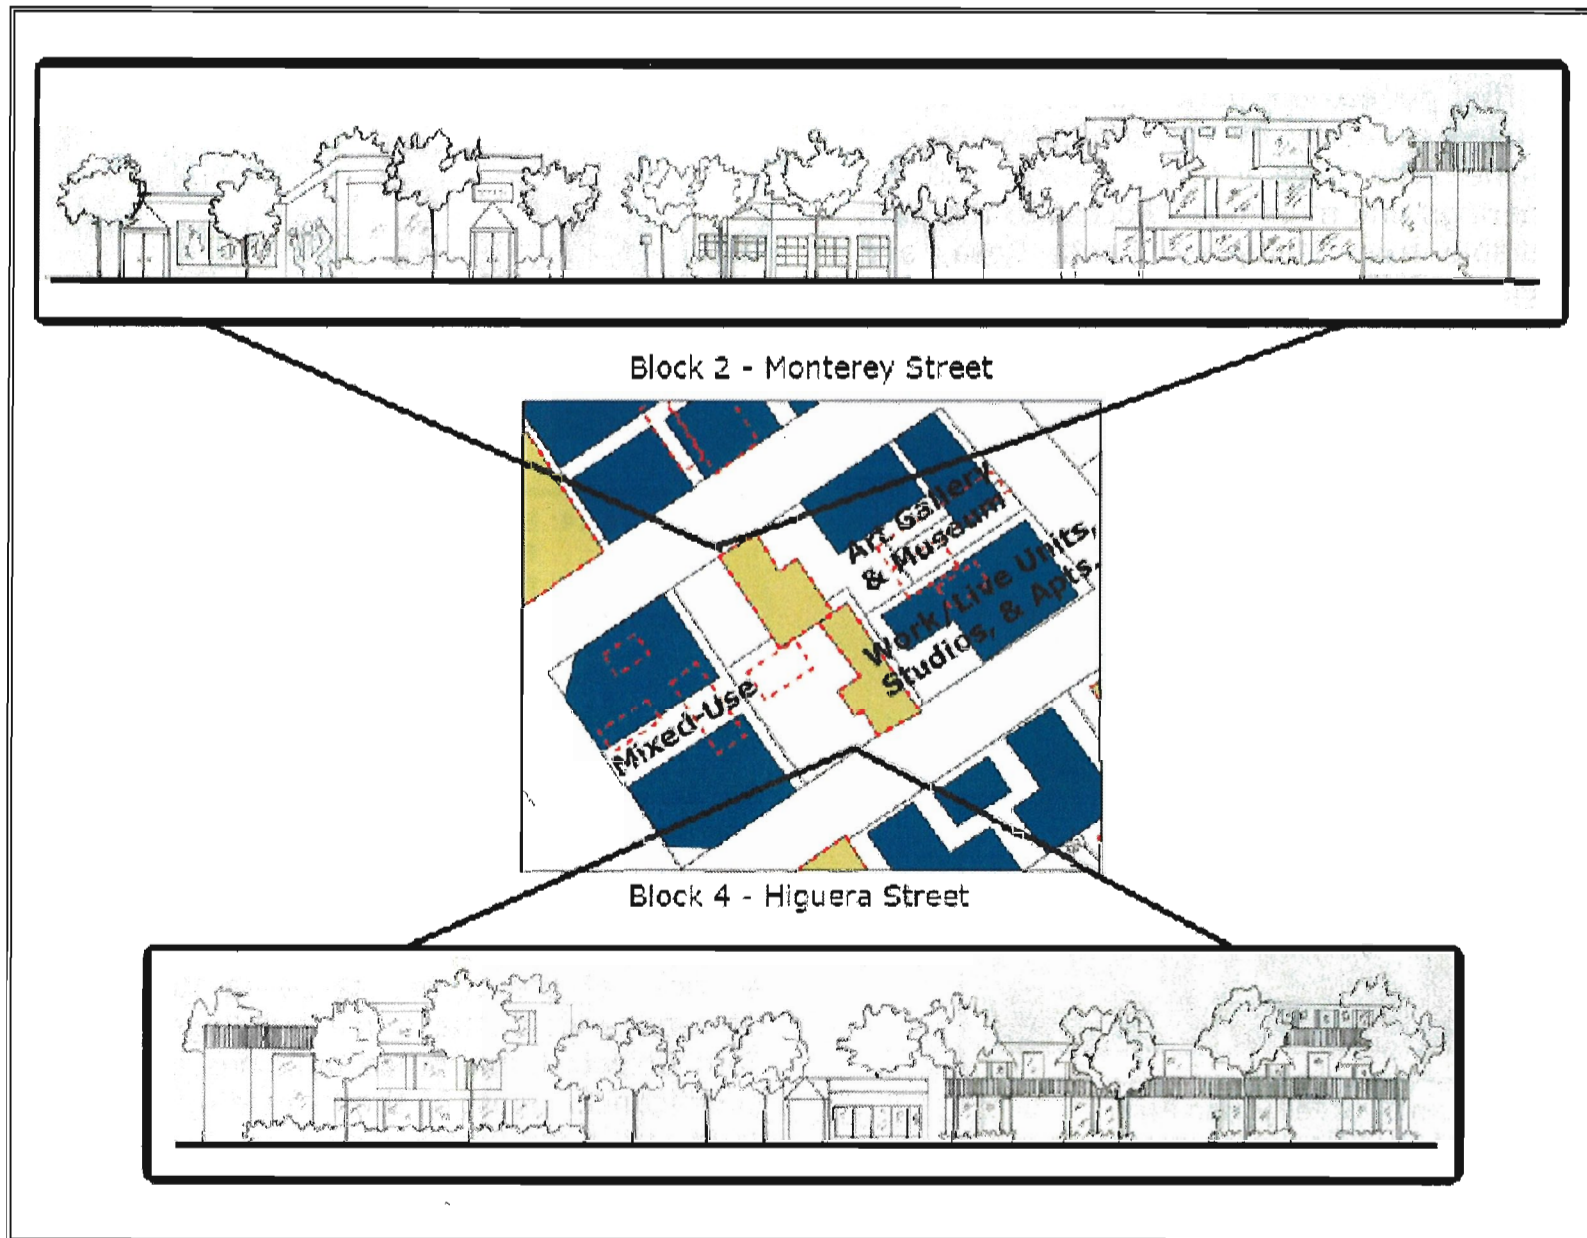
Proposed Site Plan and Street Elevations for Blocks 3 and 4
